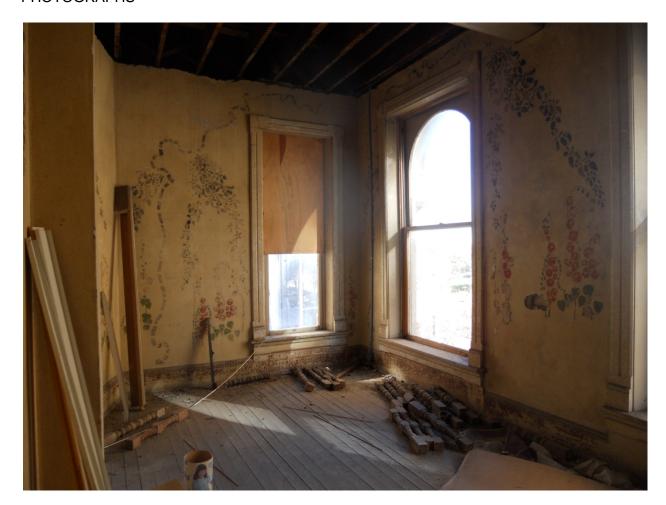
Third Floor Soledad Block Savoy Hotel room Looking North west
